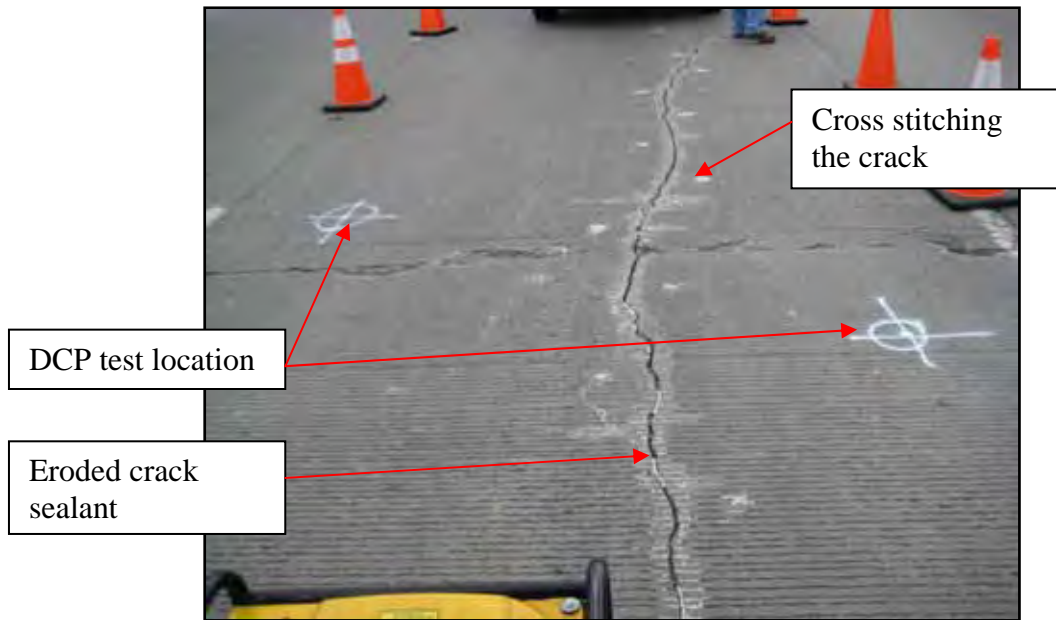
Dallas SH 289 DCP Test Location with Cracking
